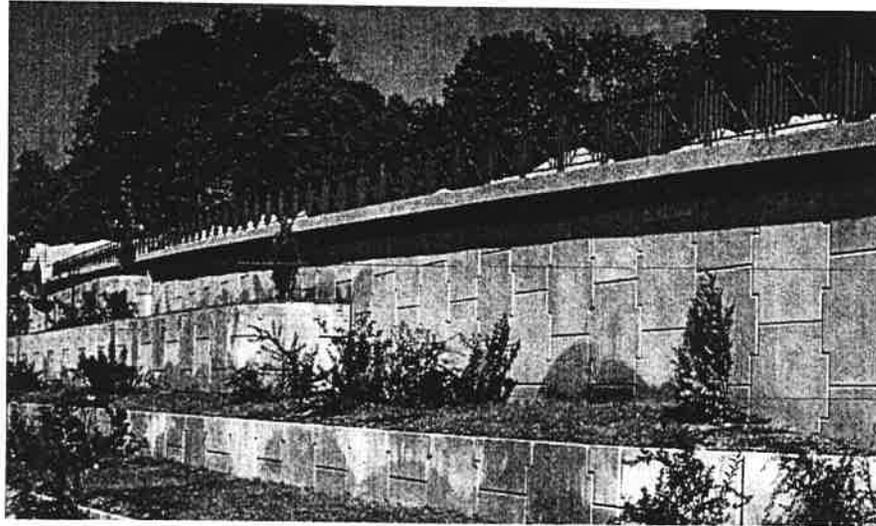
Examples of Reinforced Earth Retaining Wall Systems
